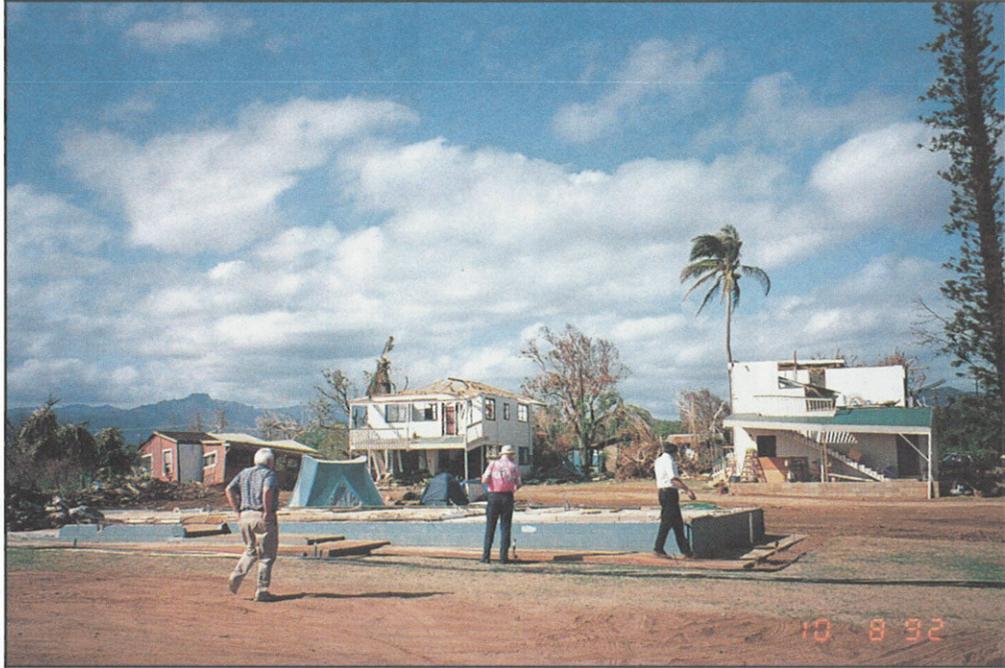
Typical example of residential construction along Poipu Beach that was destroyed because it was not elevated above the flood hazard.
